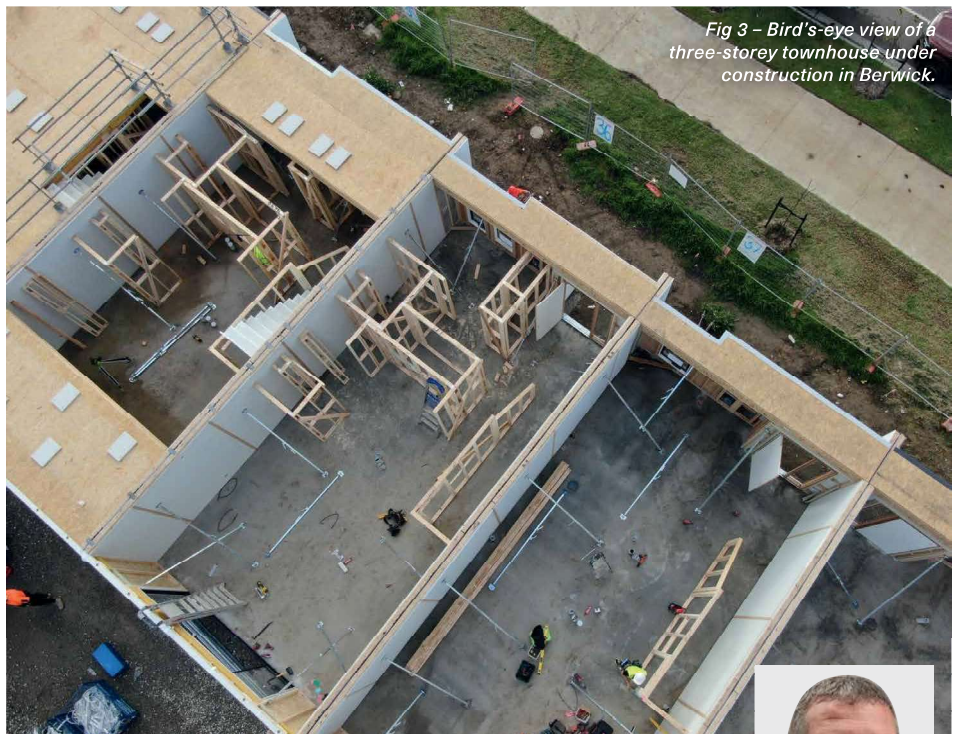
Bird's-eye view of a three-storey townhouse under construction in Berwick.
